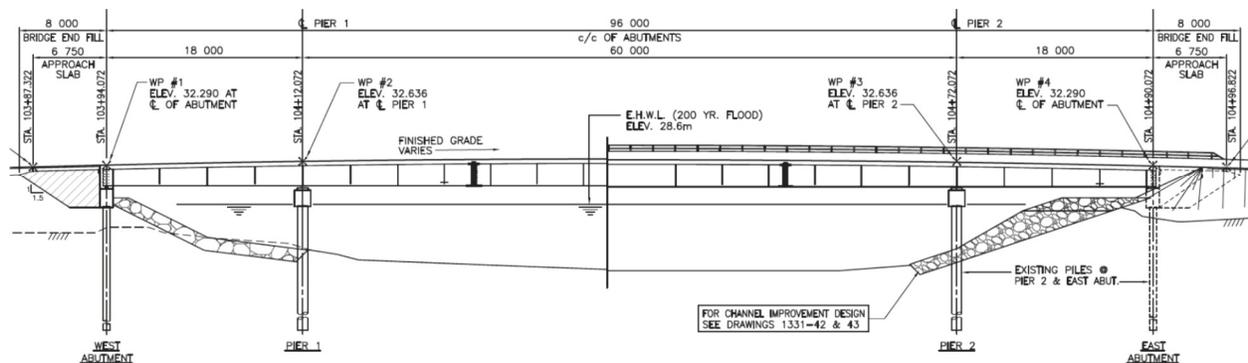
Final design concept: Continuous composite steel plate girders over the entire length of the bridge [BC MoTI]
